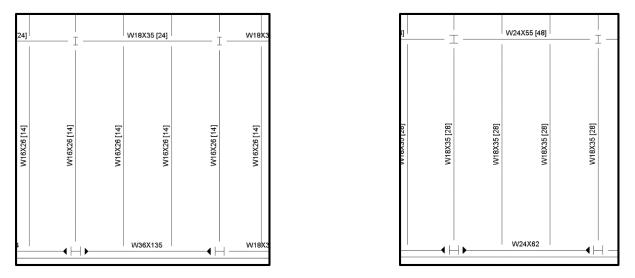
Typical steel bay supporting base building (left) and greenhouse (right).
